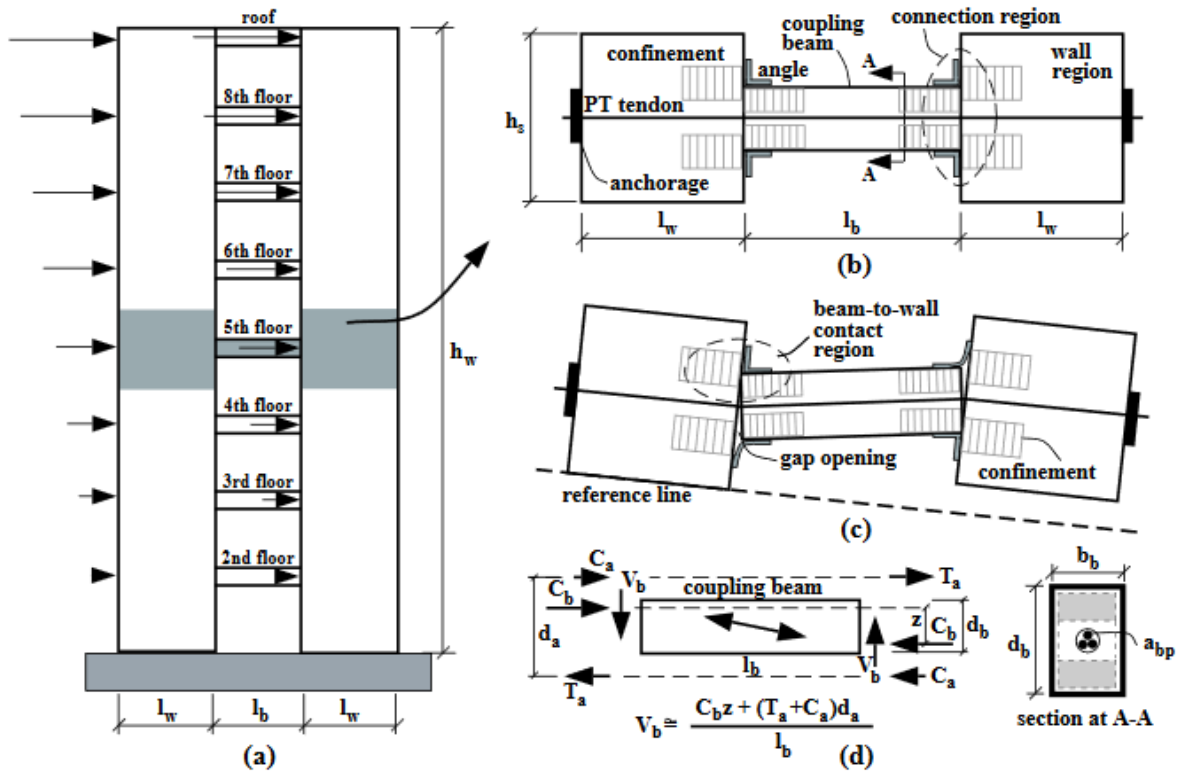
Coupled wall system – (a) multi-story wall; (b) subassembly; (c) deformed shape; (d) coupling forces
